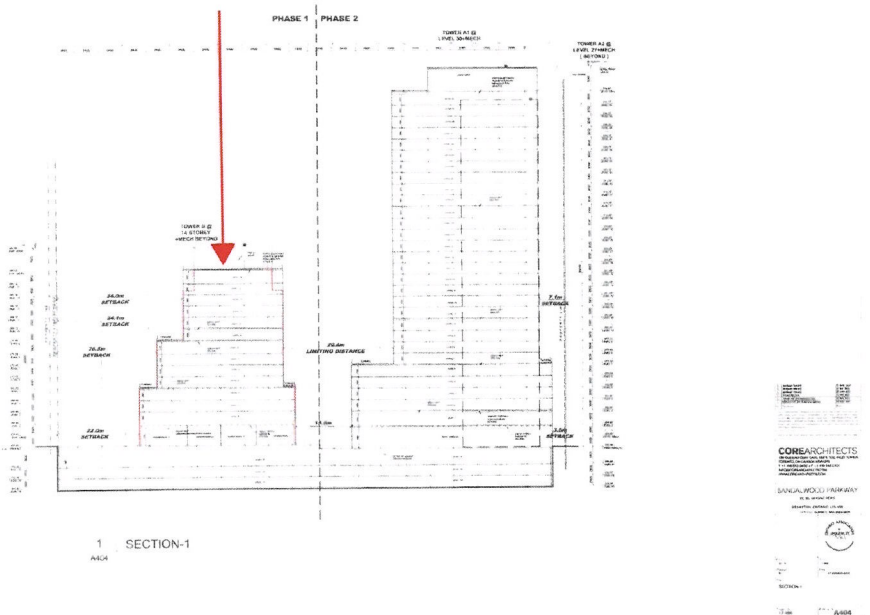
Proposed Elevation, with Proposed Variance #2 – 14-Storey Height
